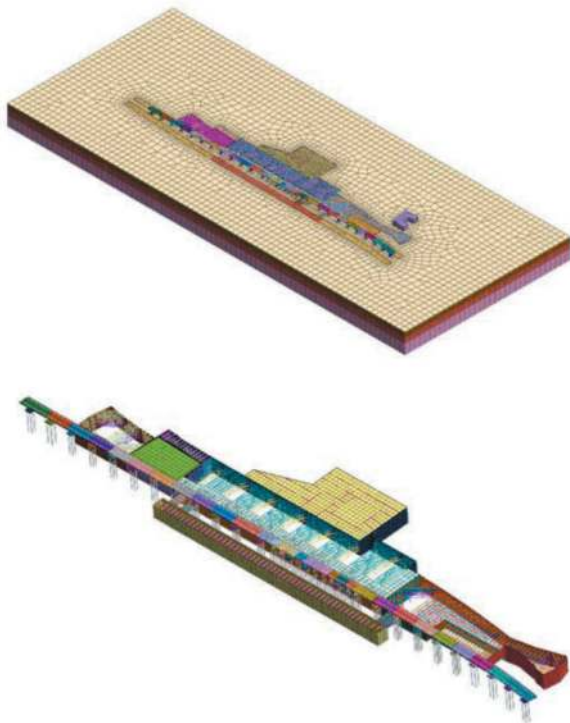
Elevated calculation model of the main foundation pit of Dayun hub near subway Line 3.
